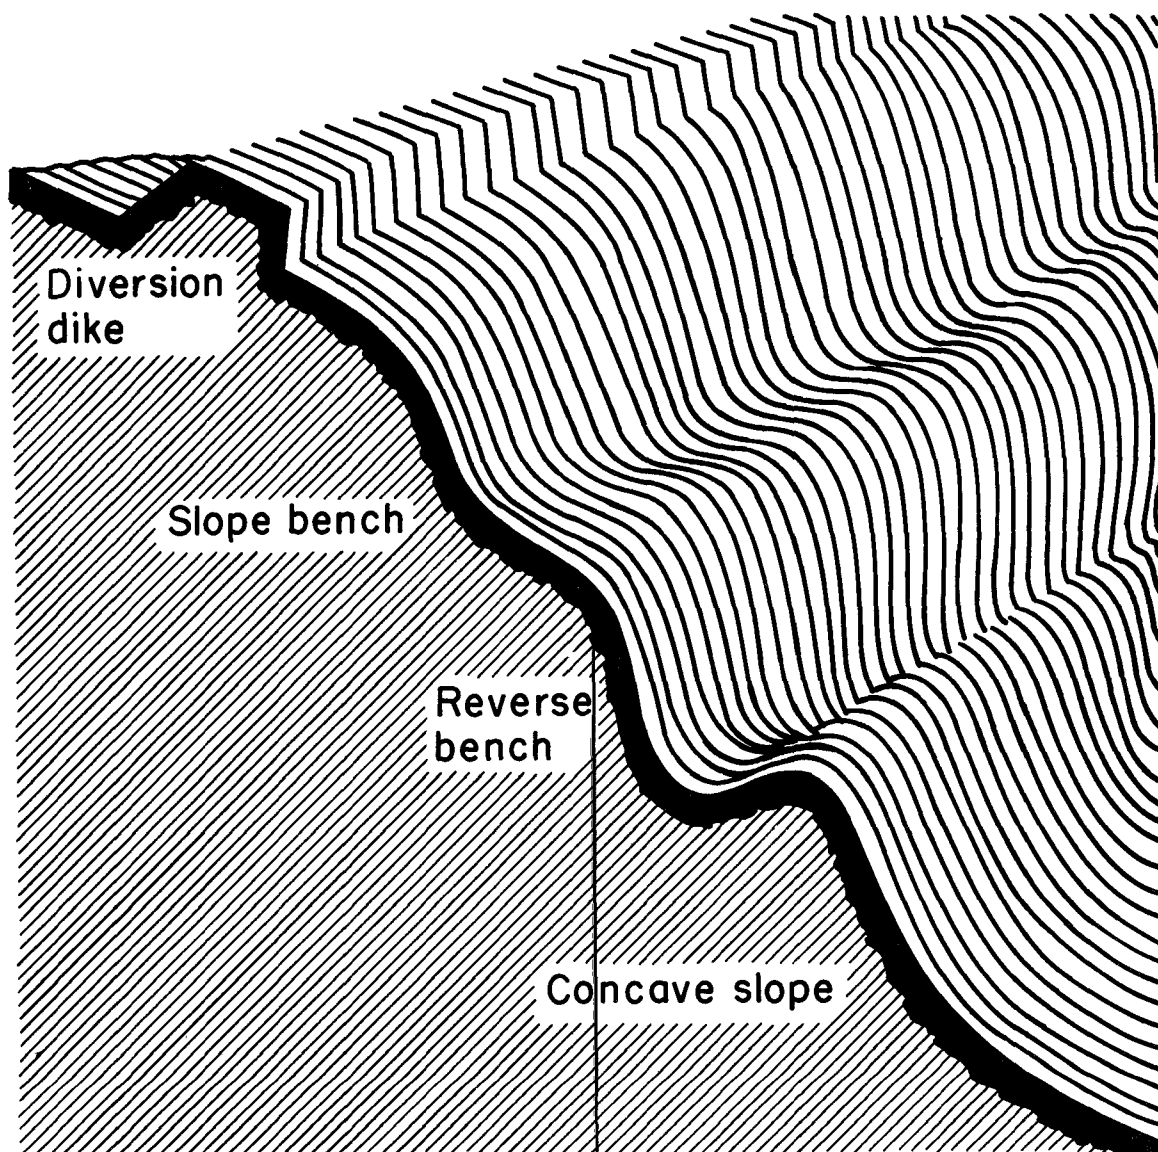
Slope reduction measures using sloped benches, reverse benches, and concave slopes (Hittman, 1976).
